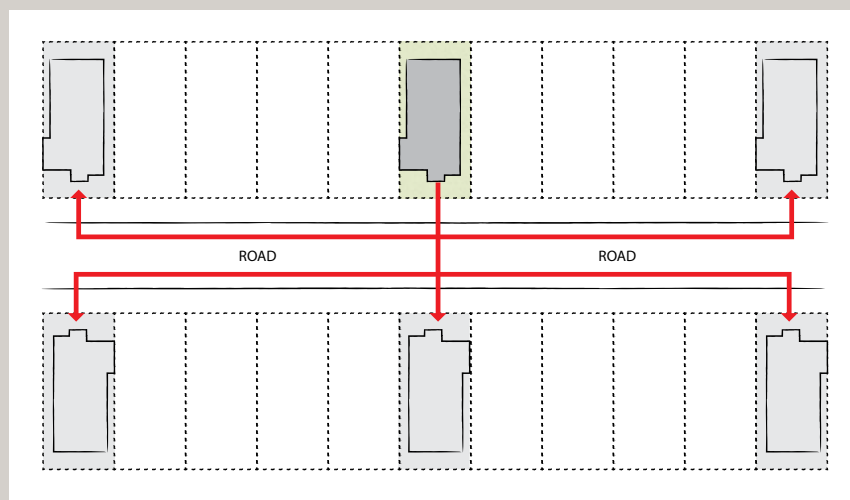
FIVE LOT SEPARATION BETWEEN TWO DWELLINGS WITH SIMILAR FAÇADES
